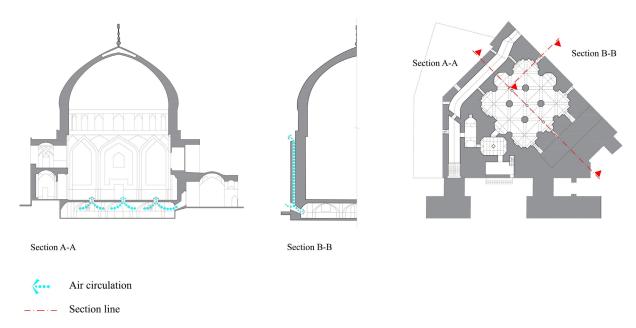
Right, basement plan; In the middle, section A-A and left, section B-B of the function of the drainage channel in the basement. Source: Authors.
